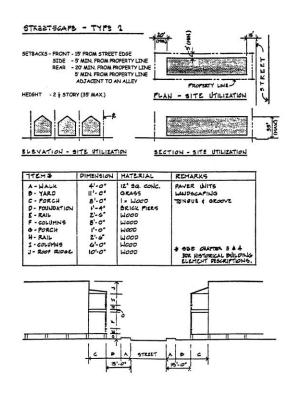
WOOD COTTAGES DISTRICT-STREETSCAPE, TYPE 2
